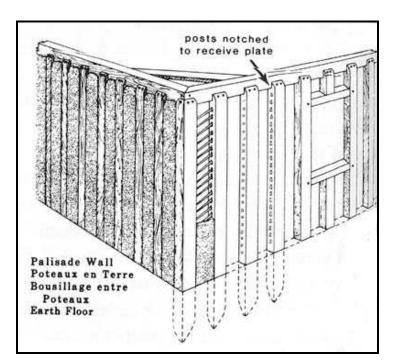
Poteaux en terre with bousillage fill and siding (Ancelet 1991: 116).
